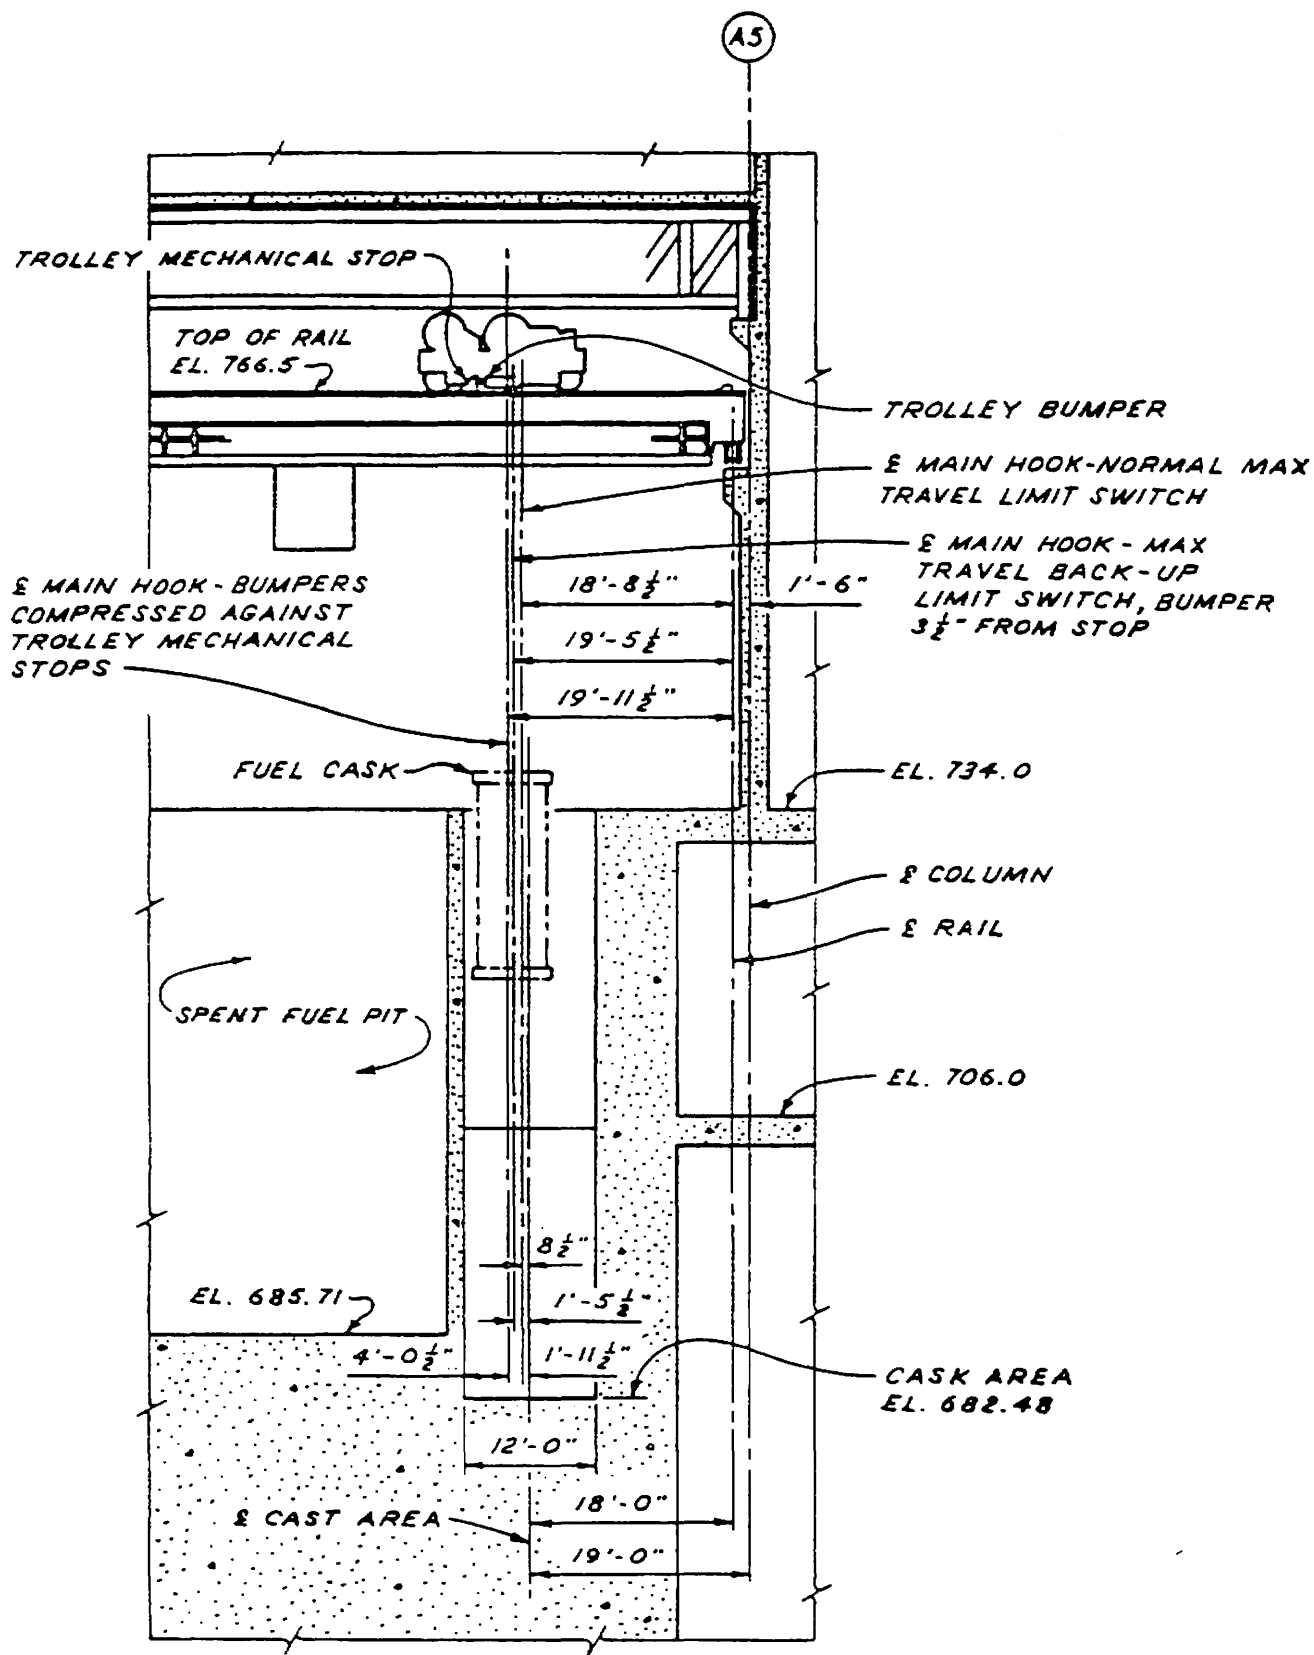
Sectional Elevation View Through The Spent Fuel Pit
